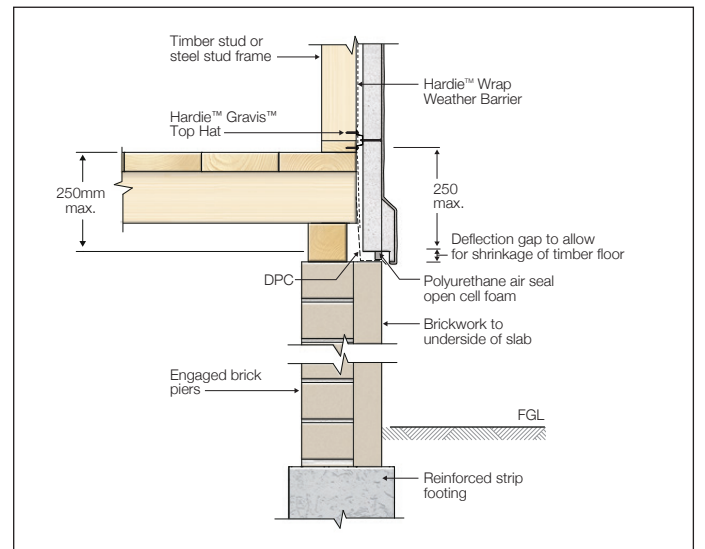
JUNCTION TO MASONRY DWARF WALL
